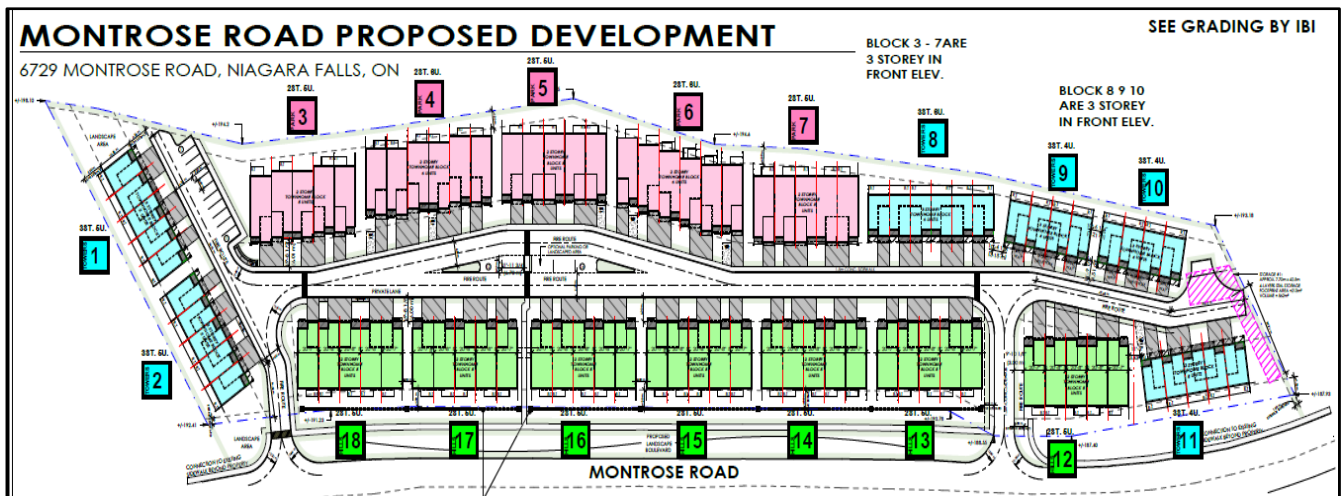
Proposed Site Plan, prepared by ACK Architects Inc.
